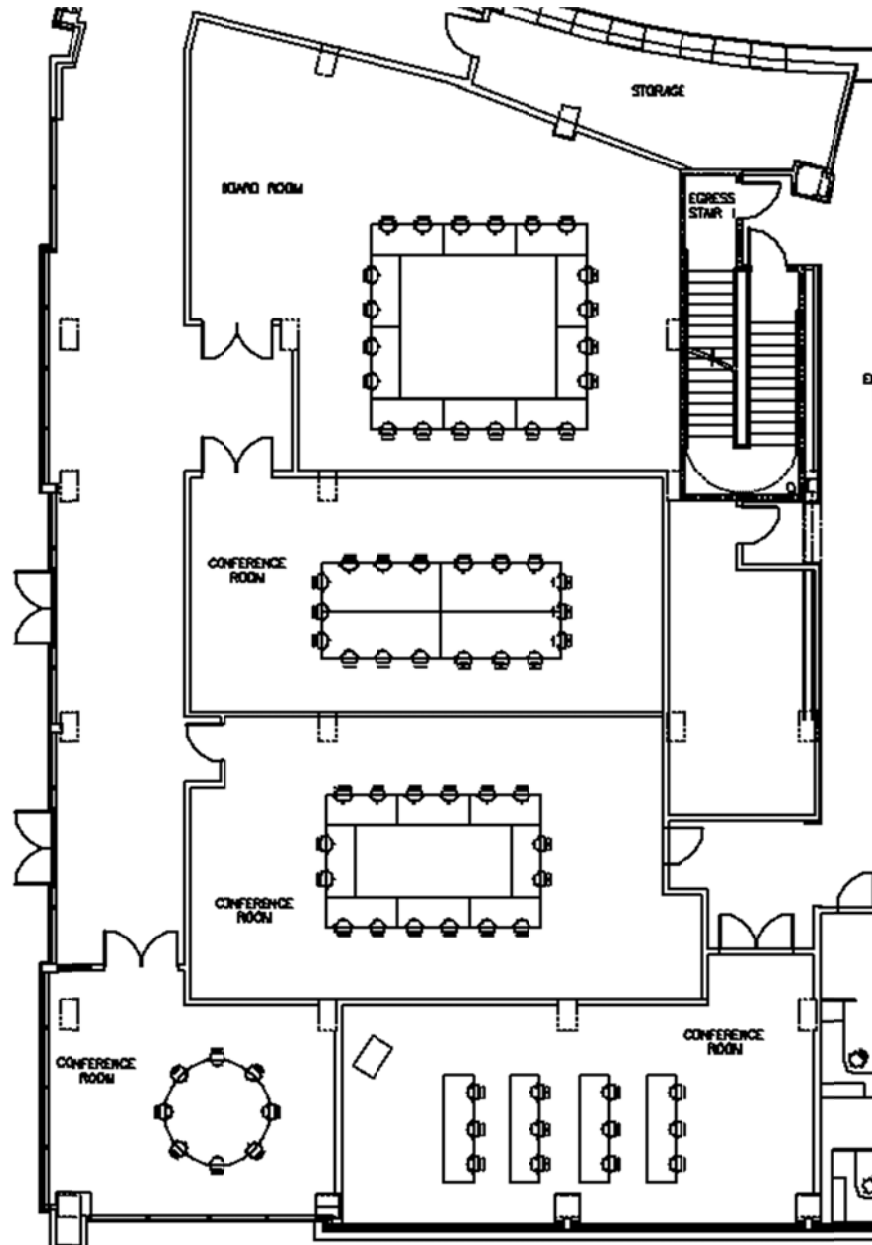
Enlarged Conference Room Floor Plan – New Layout
